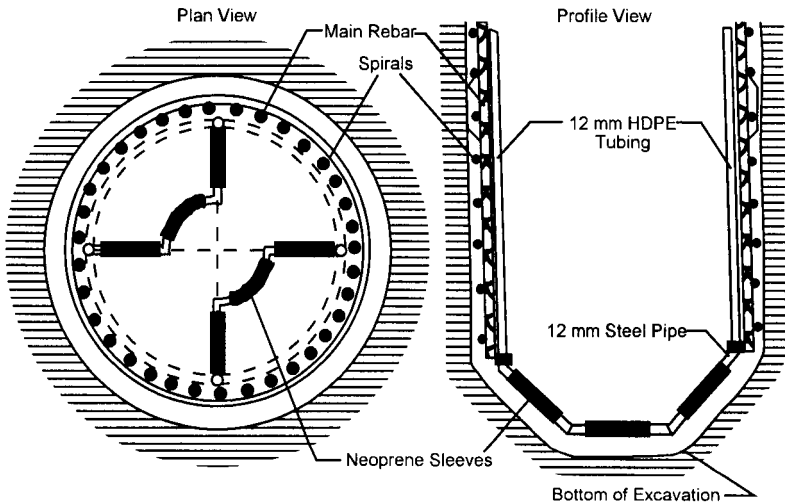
Tube-a-manchette system used in Taipei, Taiwan (Mullins, 1999).
